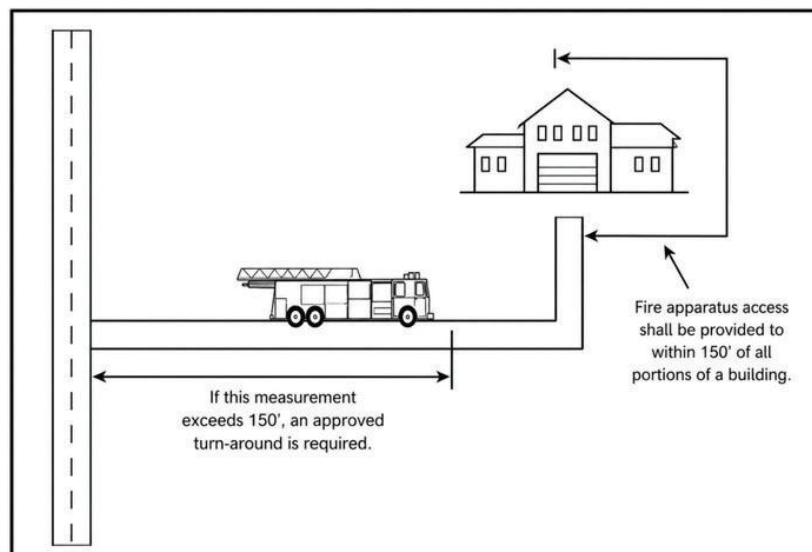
Fire Apparatus Access Road Distance from Buildings
